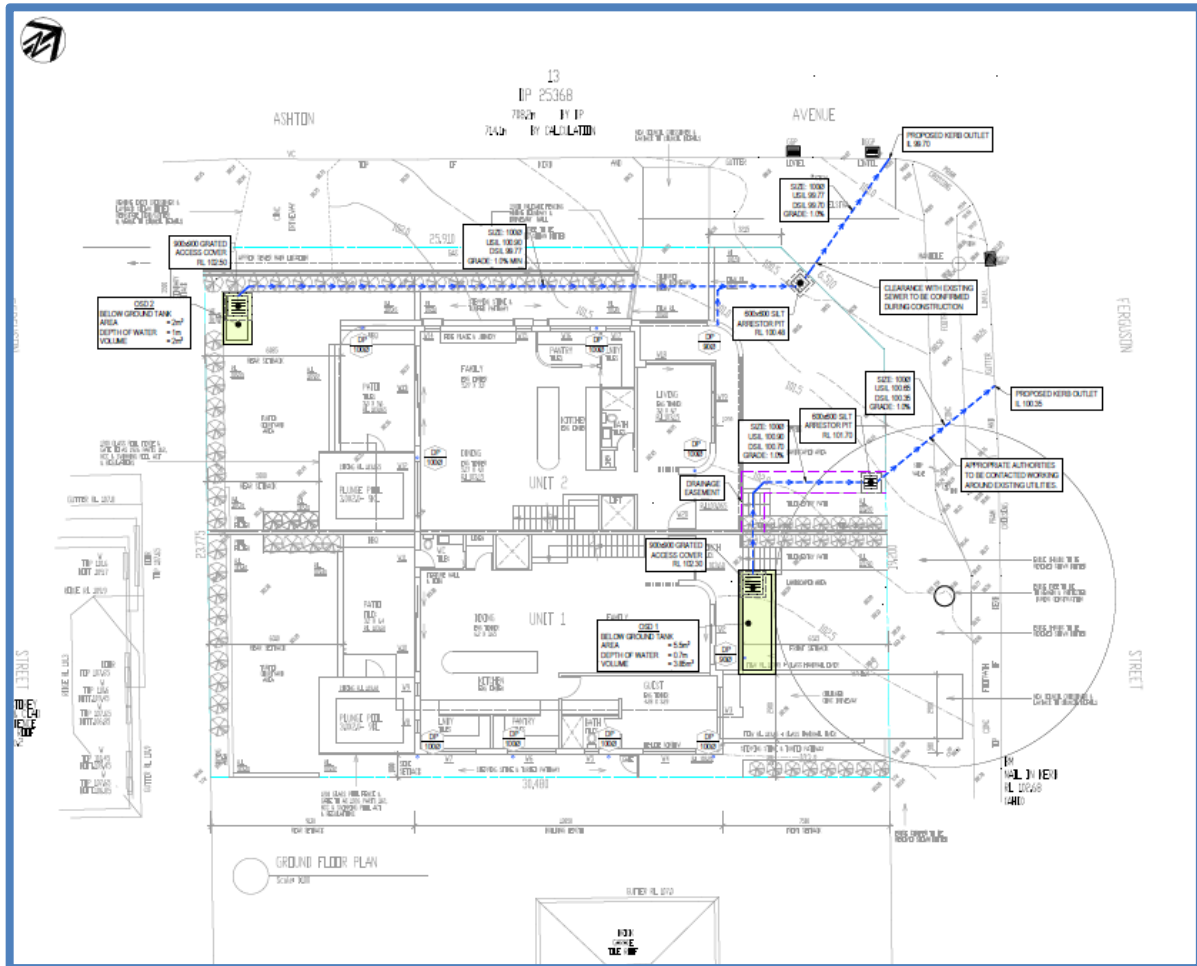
Proposed stormwater management plans (Cane Consulting).
